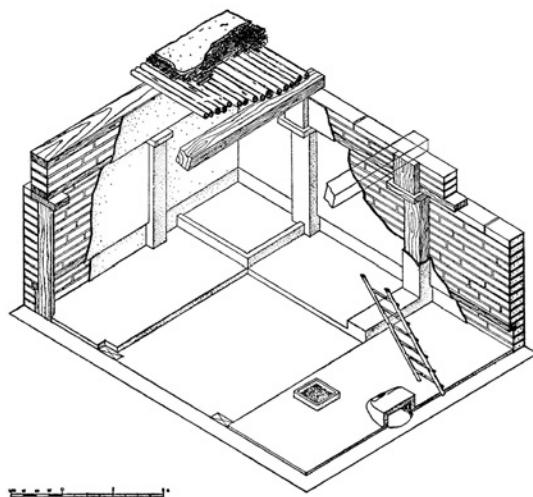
The construction of a typical Çatalhöyük house in Levels South N and O (source: Mellaart 1967).
